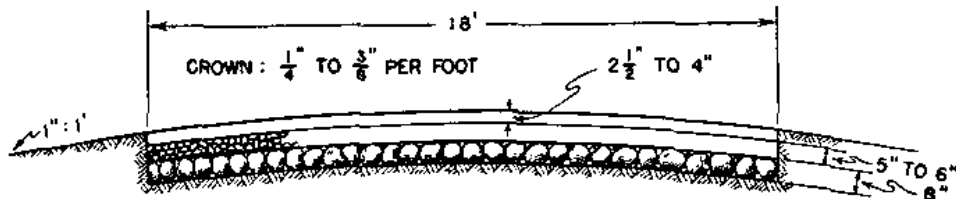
Typical section of Telford type water-bound macadam road.
